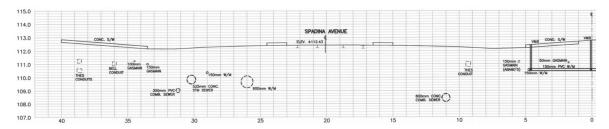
Section of existing utility underneath Spadina Avenue from Site Servicing Plan dated 2009
